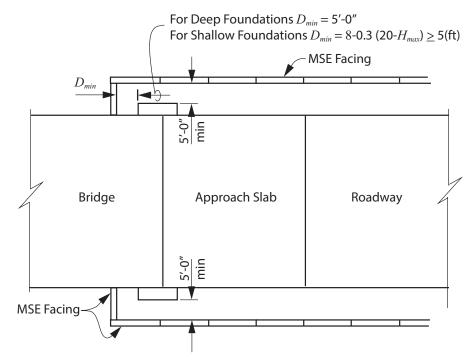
MSEA Types 1 and 2 plan (not to scale)
